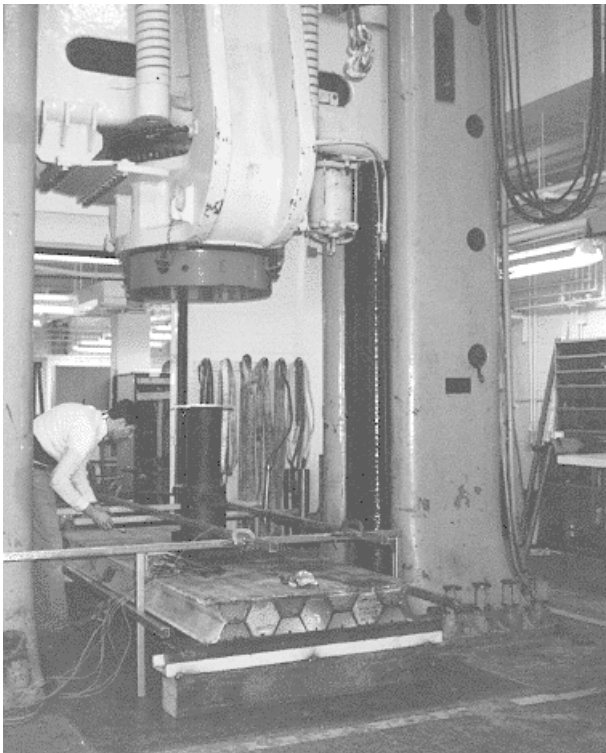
Failure test setup for H-Deck panels (VARTM section pictured).
